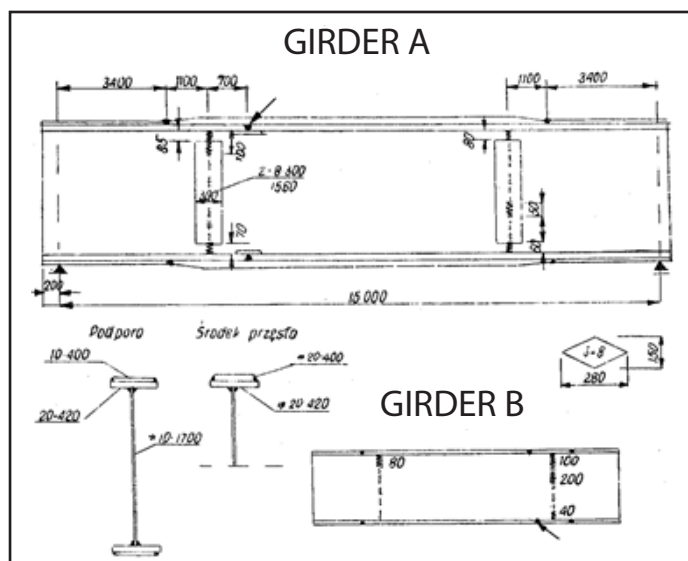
Girders A and B of track no. 1 of bridge no. III with cracked welds [12]
